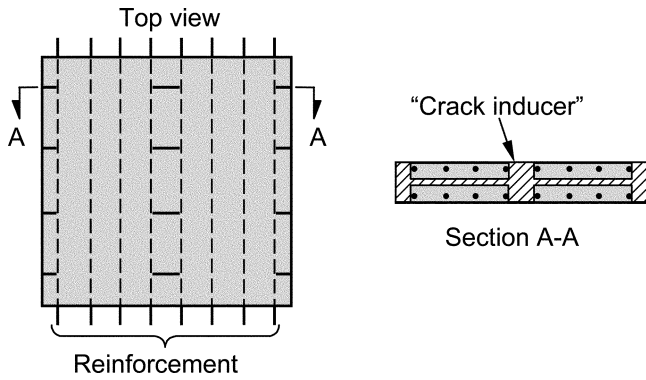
Example of test member for anchors in tension in cracked concrete.
